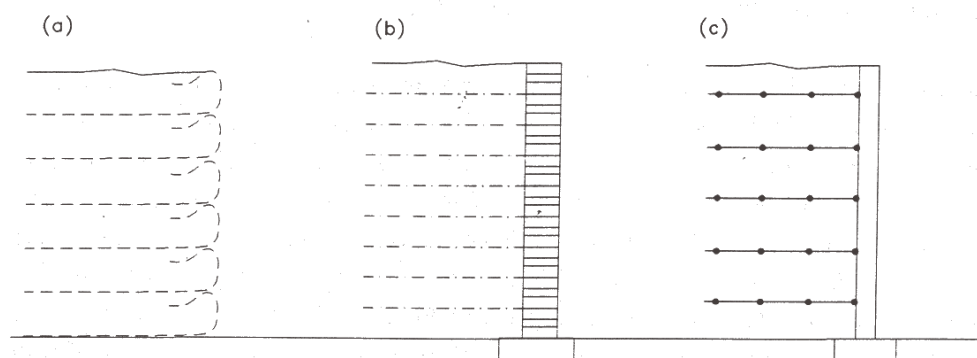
Common reinforced wall systems using geosynthetics: (a) wrap-around facing, (b) with segmental or modular concrete block, and (c) full-height precast panels (Holtz et al, 1997)
